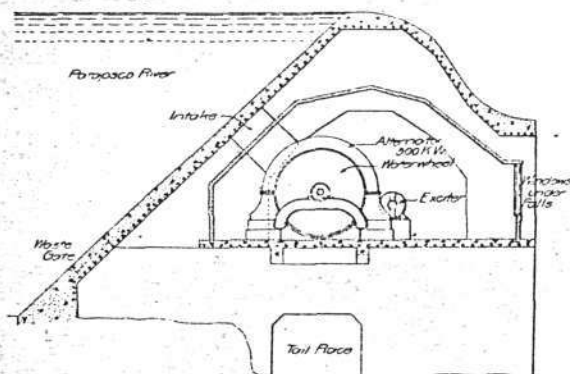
CROSS-SECTIONAL ELEVATION OF DAM.
